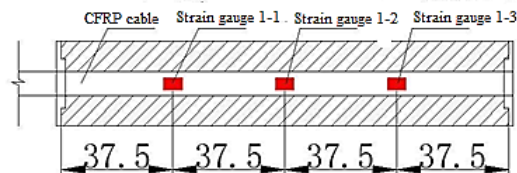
The hoop cable anchor with strain gauge (dimensions: mm)
